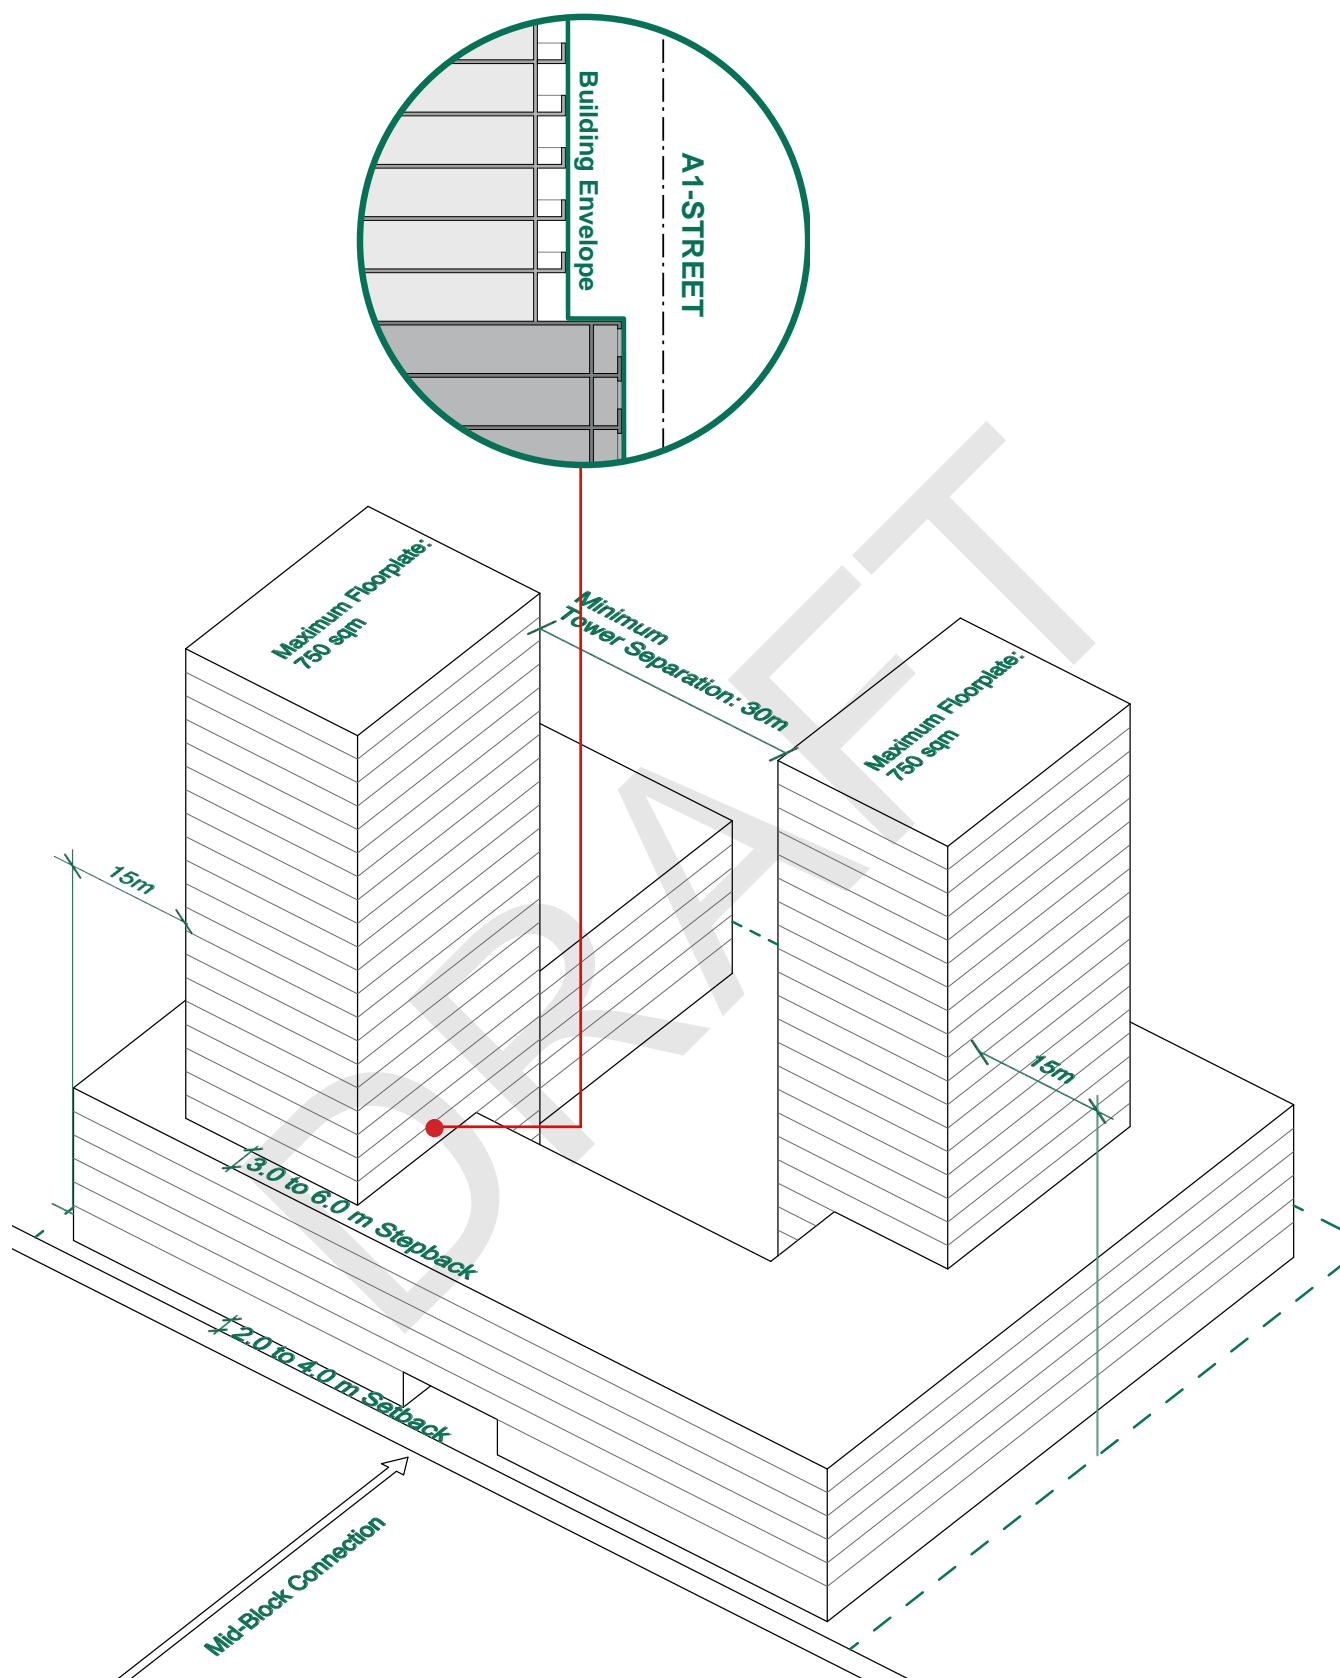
Frontage on an A1 Street. Tower separations, setbacks and floor plate sizes are also indicated.
